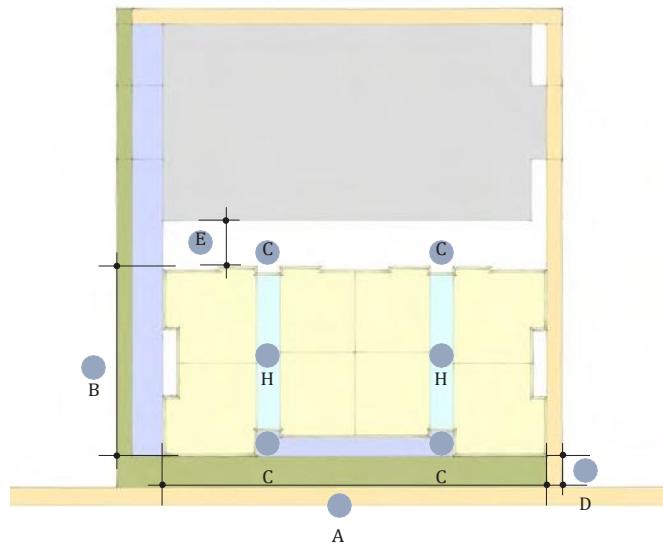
Example of Double-Aspect Walk-Up Multiple-Family Building
